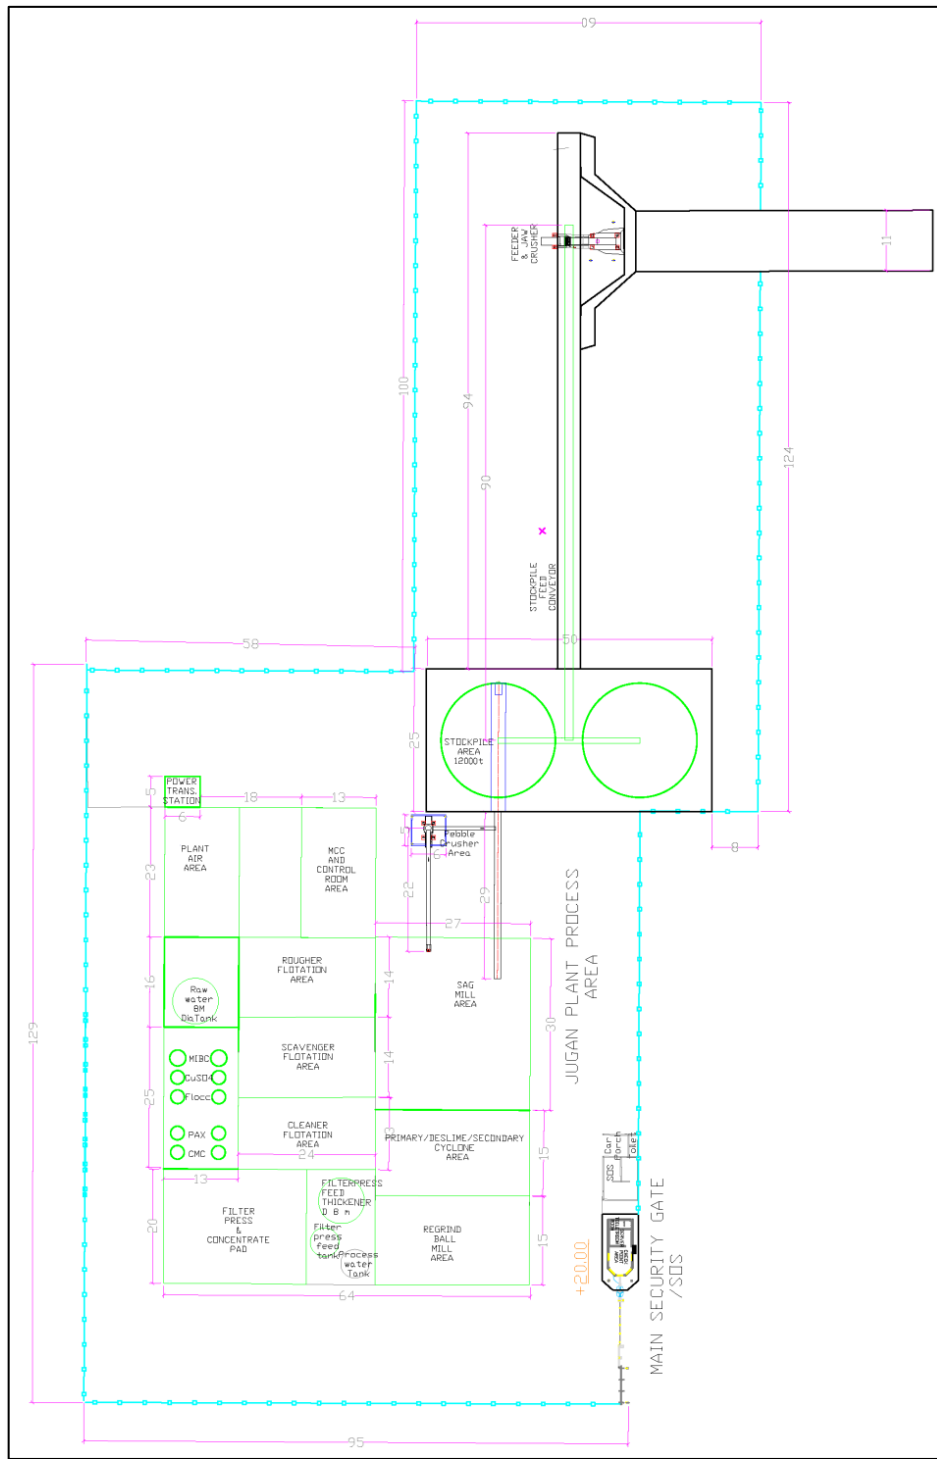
Jugan: Flotation Plant Layout Configuration
